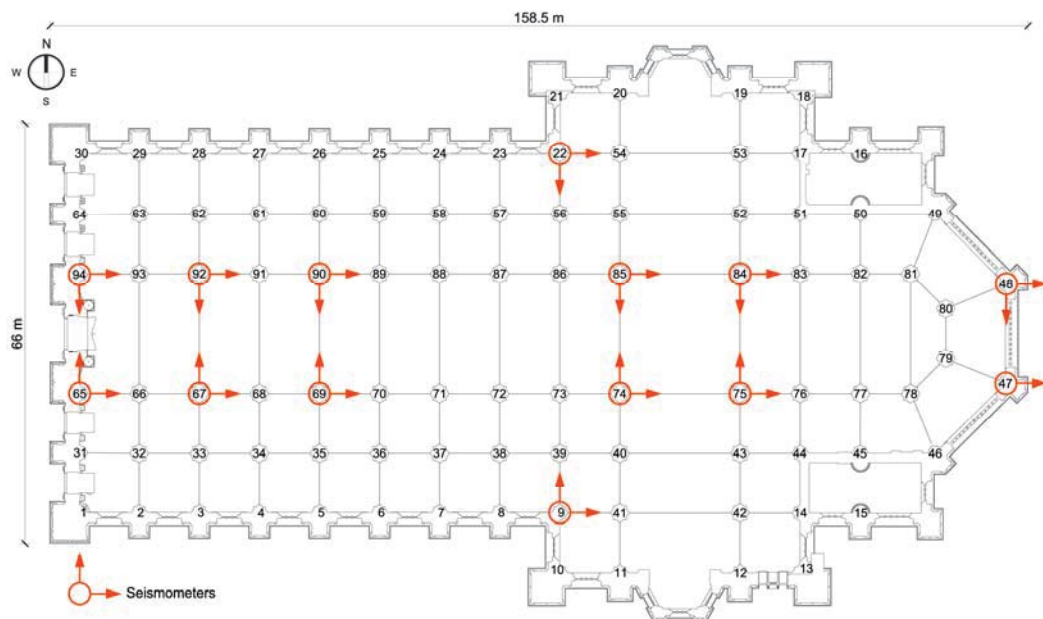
Plan of the Milan Cathedral (dimensions in m) and layout of the seismometers installed in the church.
